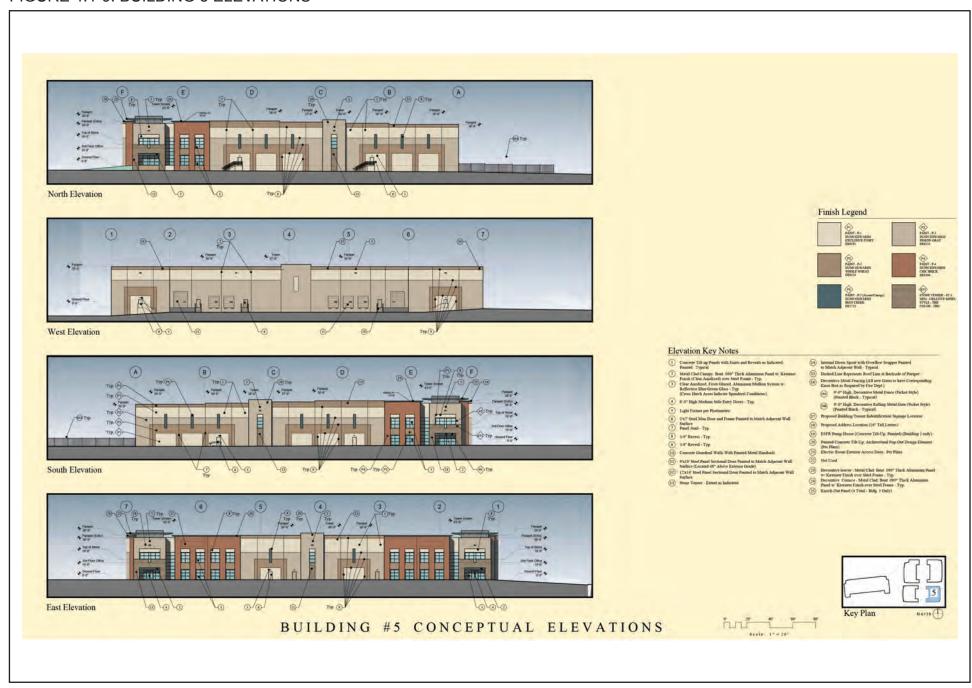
BUILDING 5 ELEVATIONS
